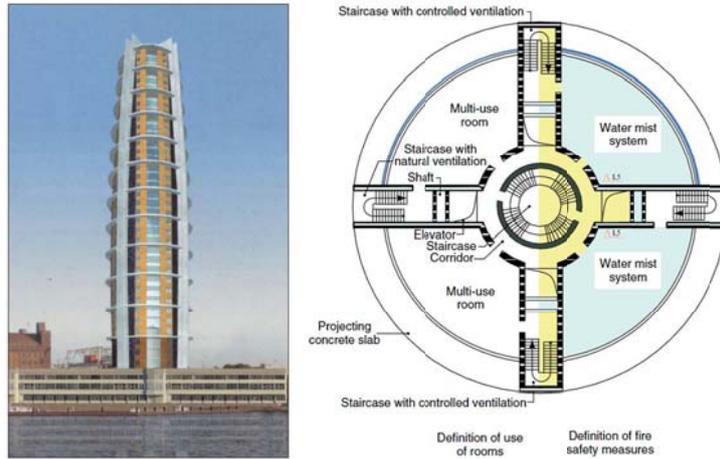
Technical feasibility of high-rise timber structure, Dock tower
